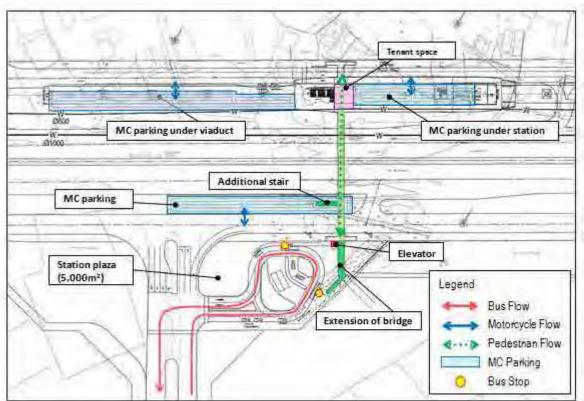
Concept Plan of the High-Tech Park Station Area
